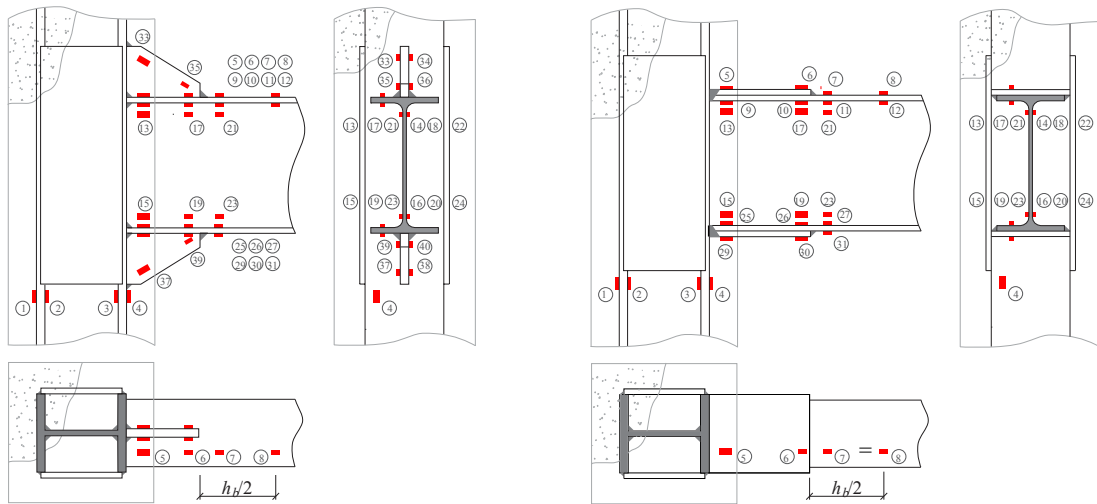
Strain gauge arrangements in case of RS and CP joint specimens
